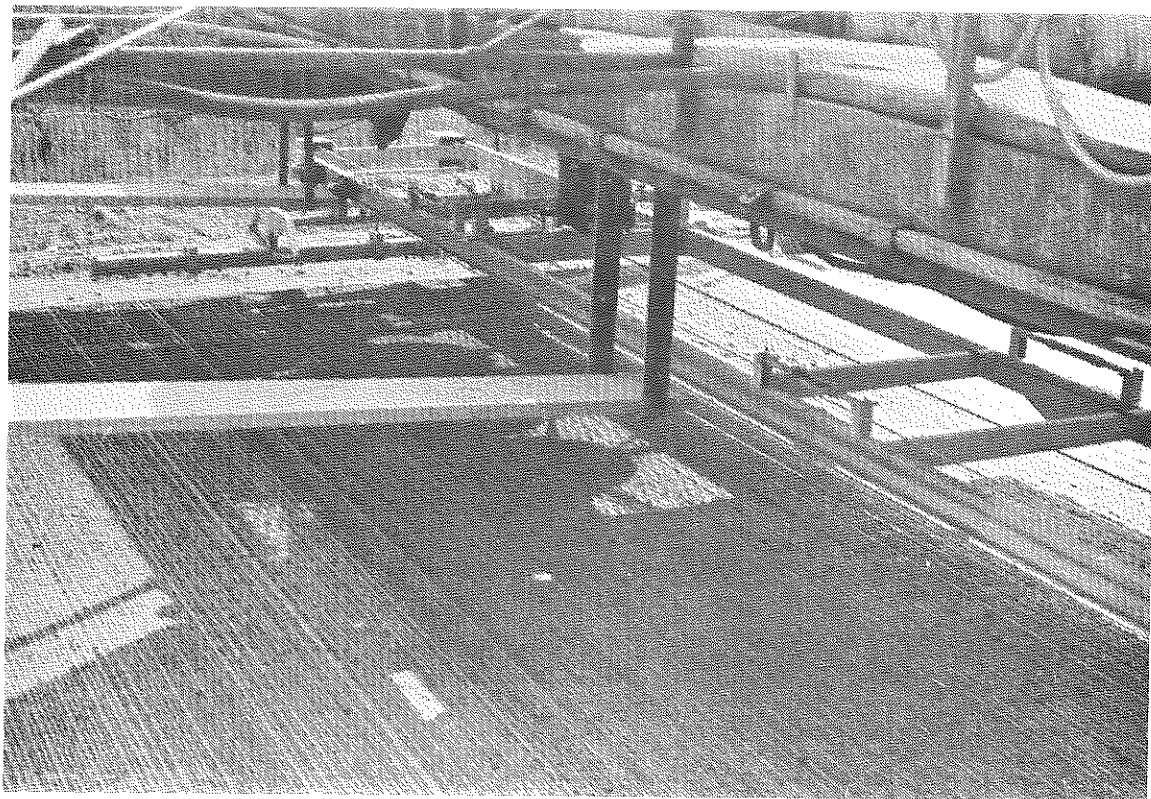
Equipment Used to Groove Portland Cement Concrete; I24-3(19)76 and I24-3(18)65 (photo taken on I24-3(18)65).
